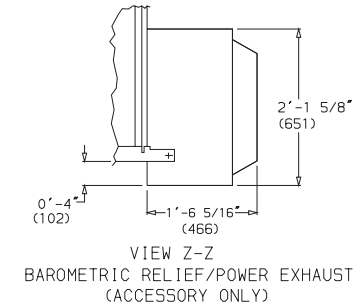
Base Unit Dimensions; 48TJ024,028
